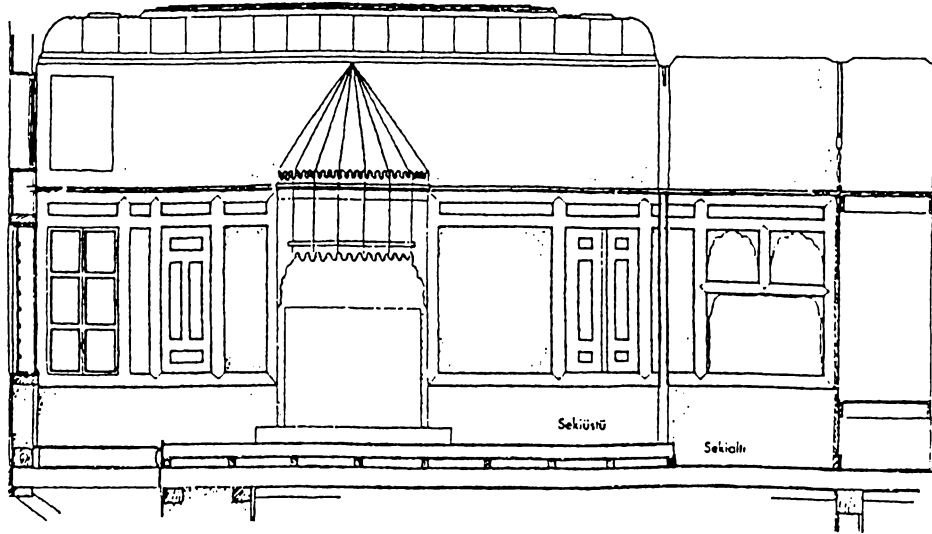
House at Safranbolu - Section with fireplace (Kuban 68)
